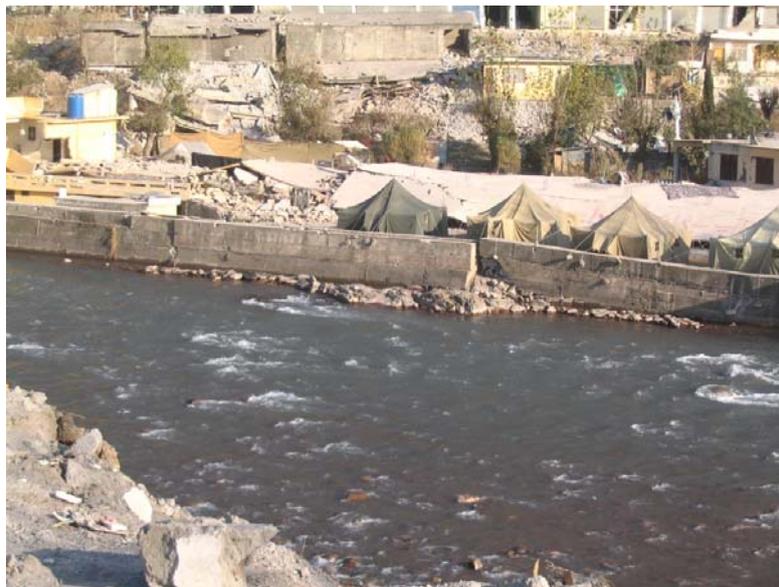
Displaced concrete gravity retaining wall by Kunhar River in Balakot
